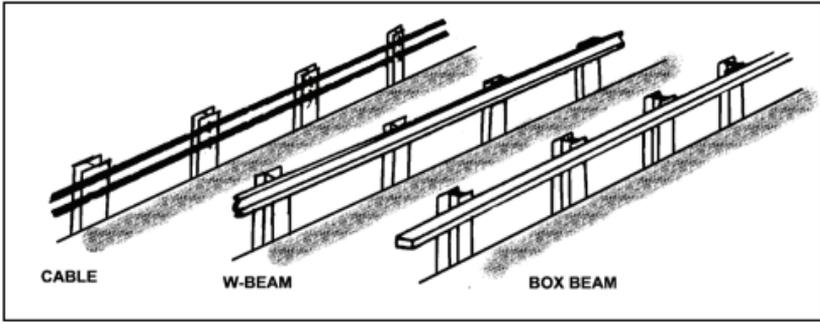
Typical Guardrail Construction (UFC 4-022-02)
